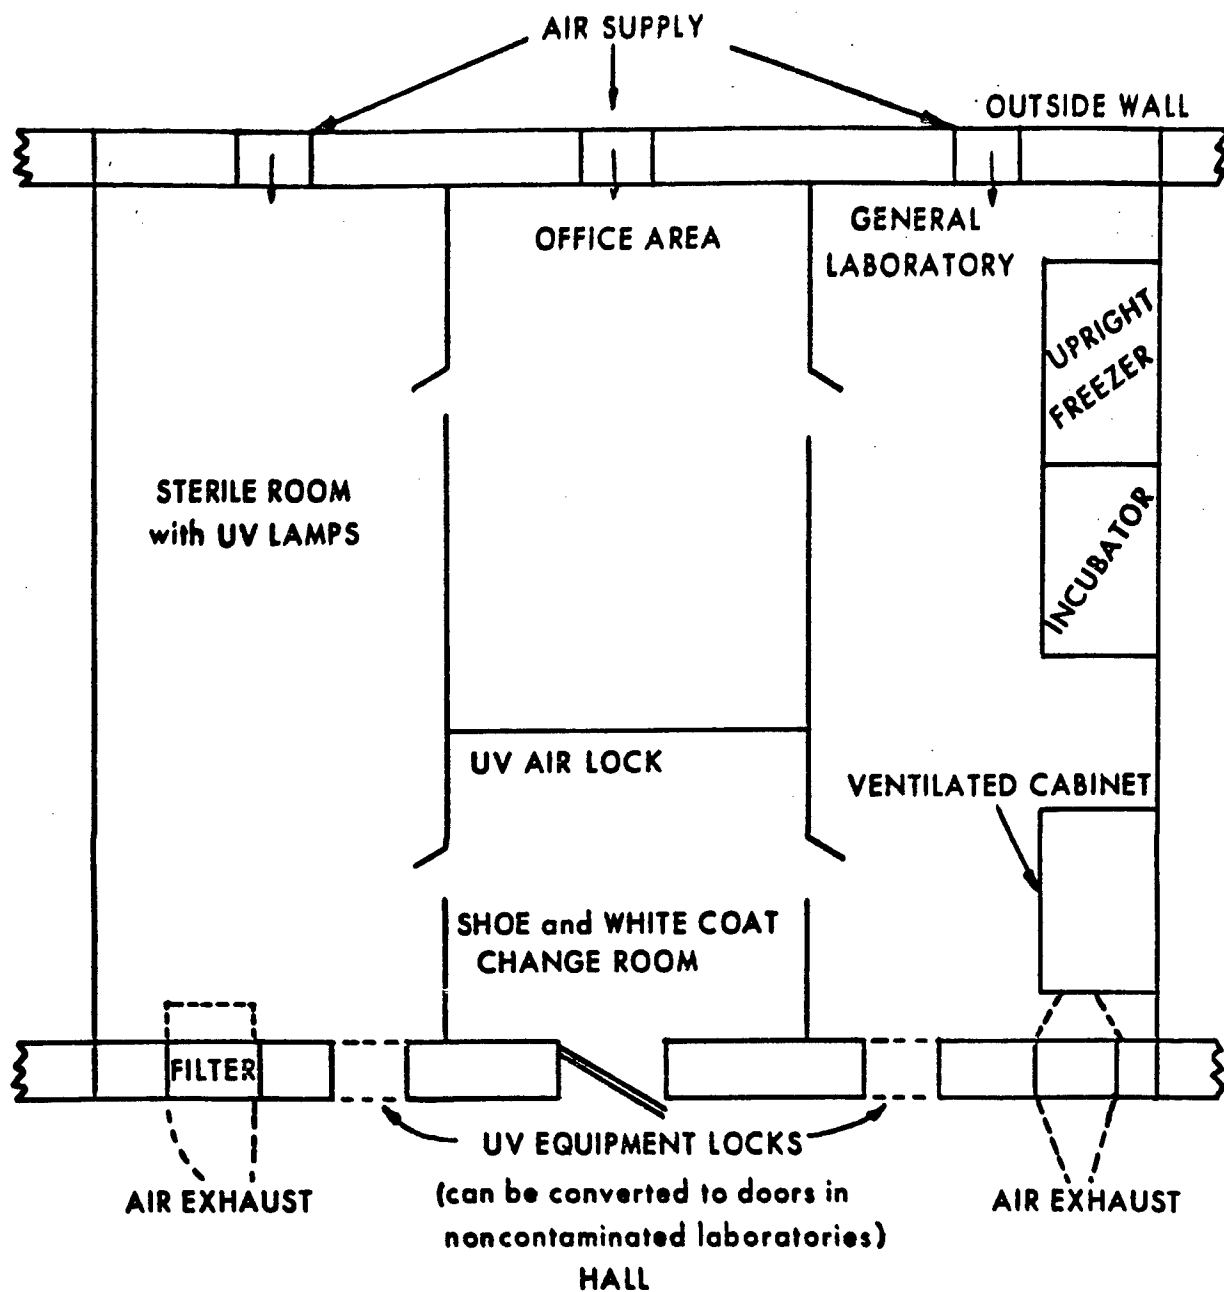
Floor Plan of a Swedish Virus Laboratory Suite.
